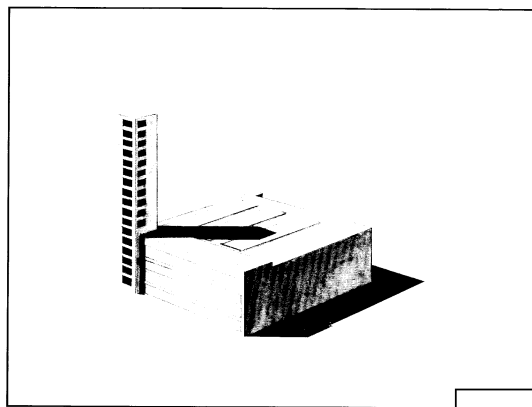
PERSPECTIVE DRAWING OF THE PROBABLE FABRICATION/ASSEMBLY BUILDING WITH A POSSIBLE CHECKOUT TOWER. (See item 98, Figure 2.)
